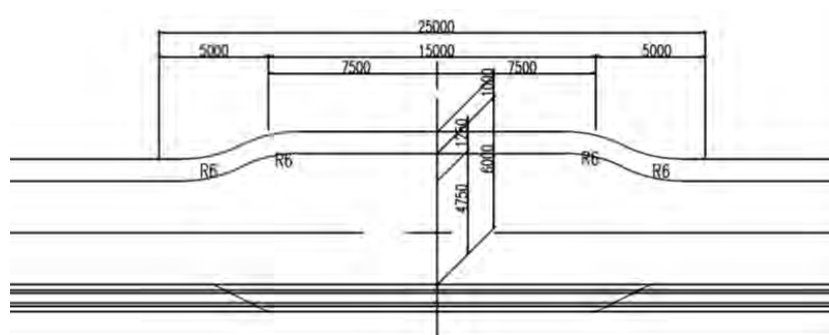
General Layout of Emergency Parking and Passing Lane
